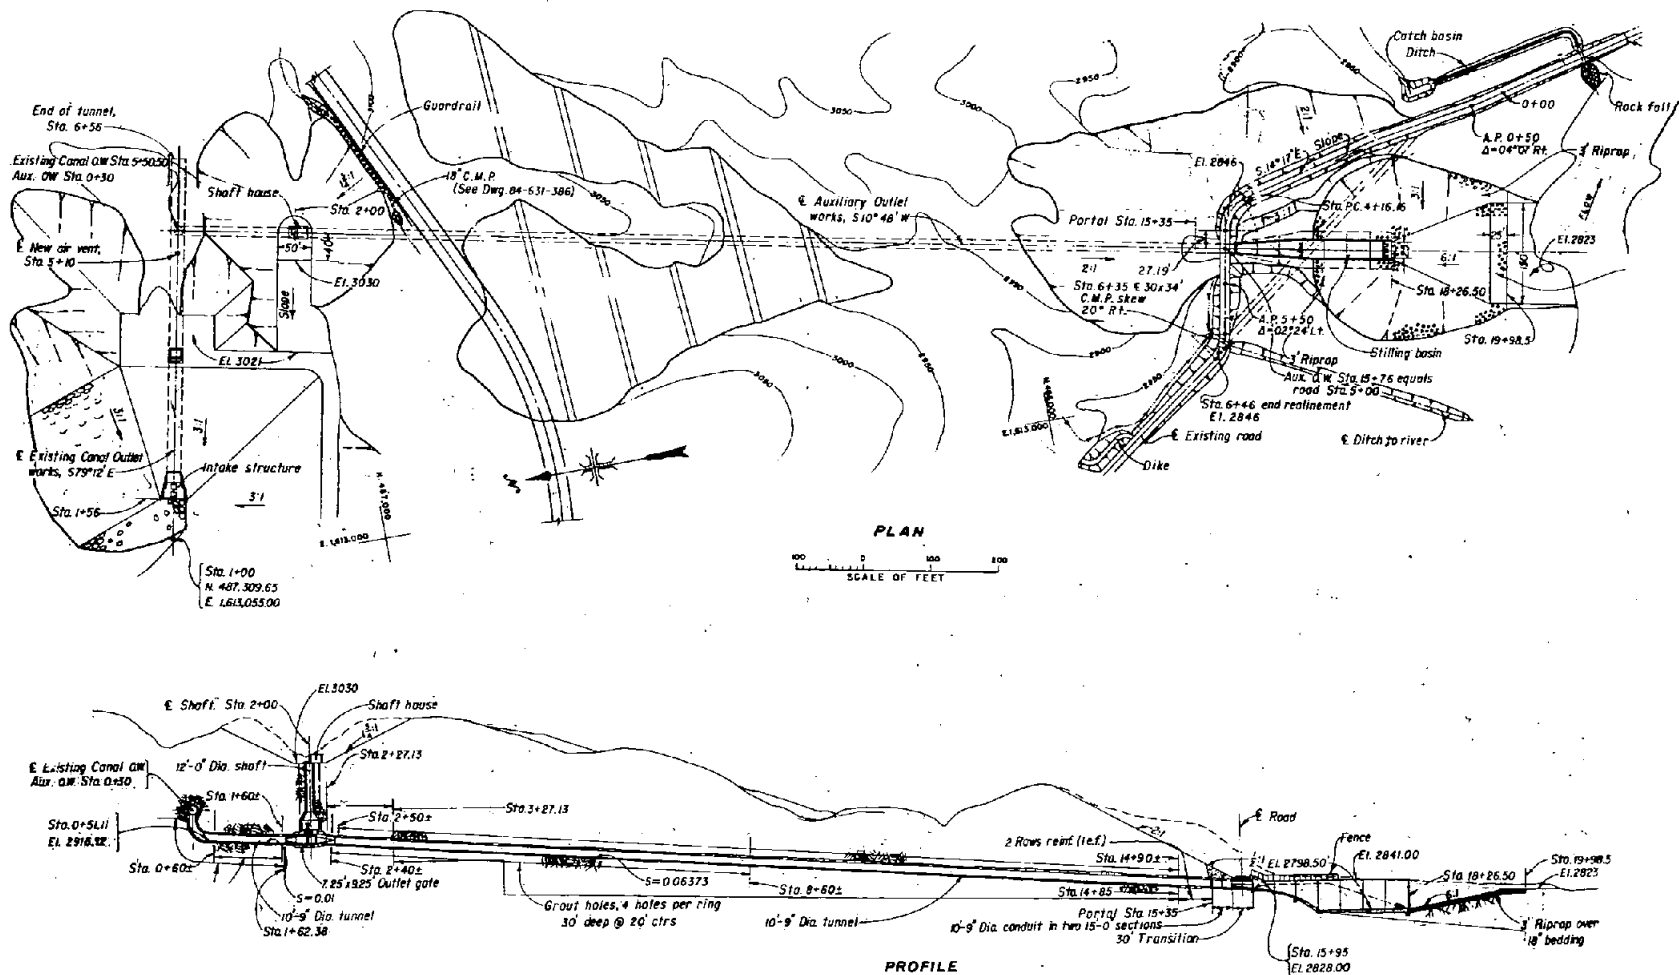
Tiber Dam Auxiliary Outlet Works—Plan and profile.
